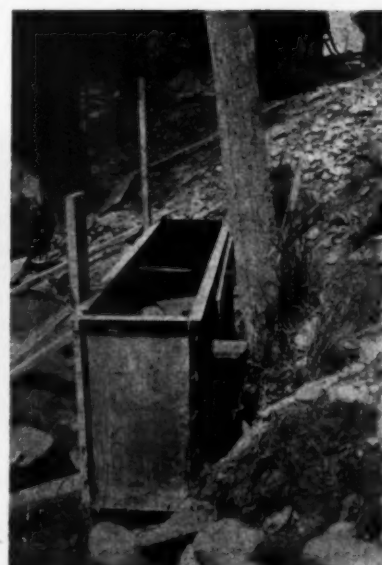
(left)—An "Alemite" Double Box Culvert. Fig. 15 (below)—Cast-Iron Pipe Leading to Culvert. Fig. 16 (right)—The Improvised Roller Was a Failure
